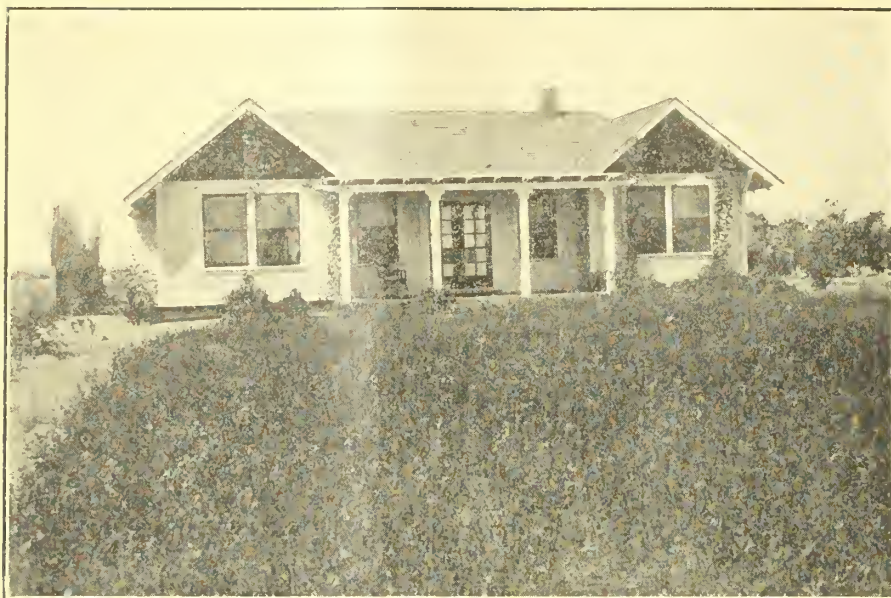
House built to a plan similar to Figure 1. The porch was added two years after the first construction work. It may yet be screened
